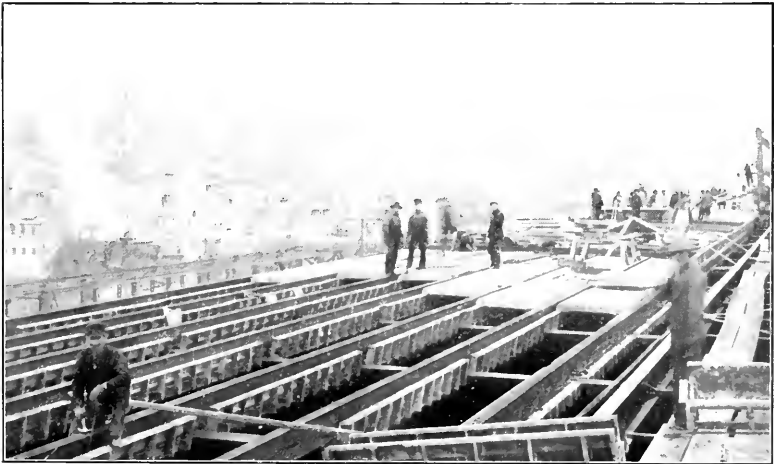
CONCRETE FLOOR-TROUGH AND COVER STYLE OF FORM.
